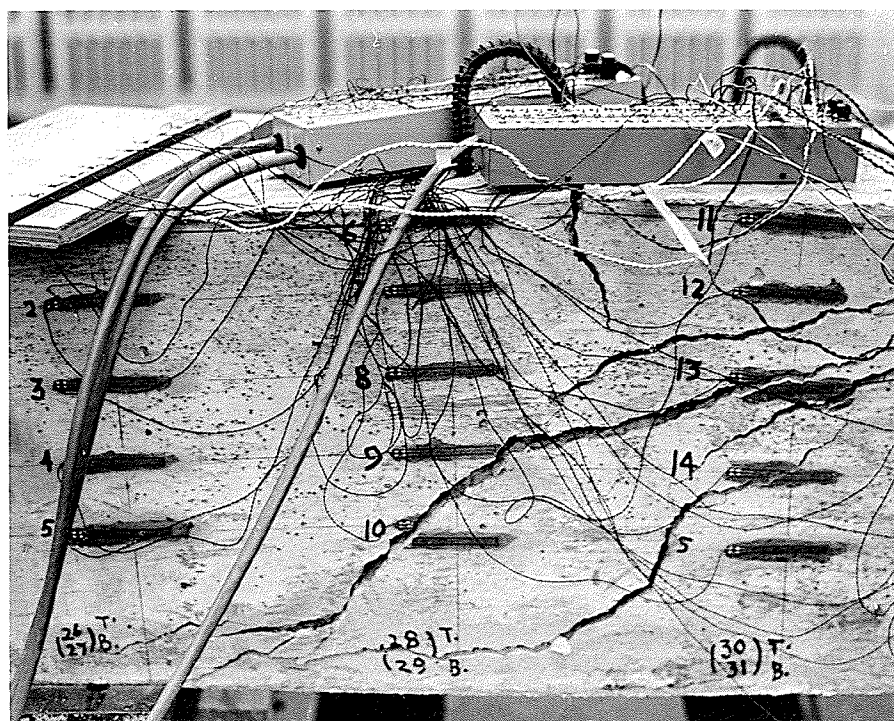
A CLOSE VIEW OF FAILURE OF BEAM IB-4
